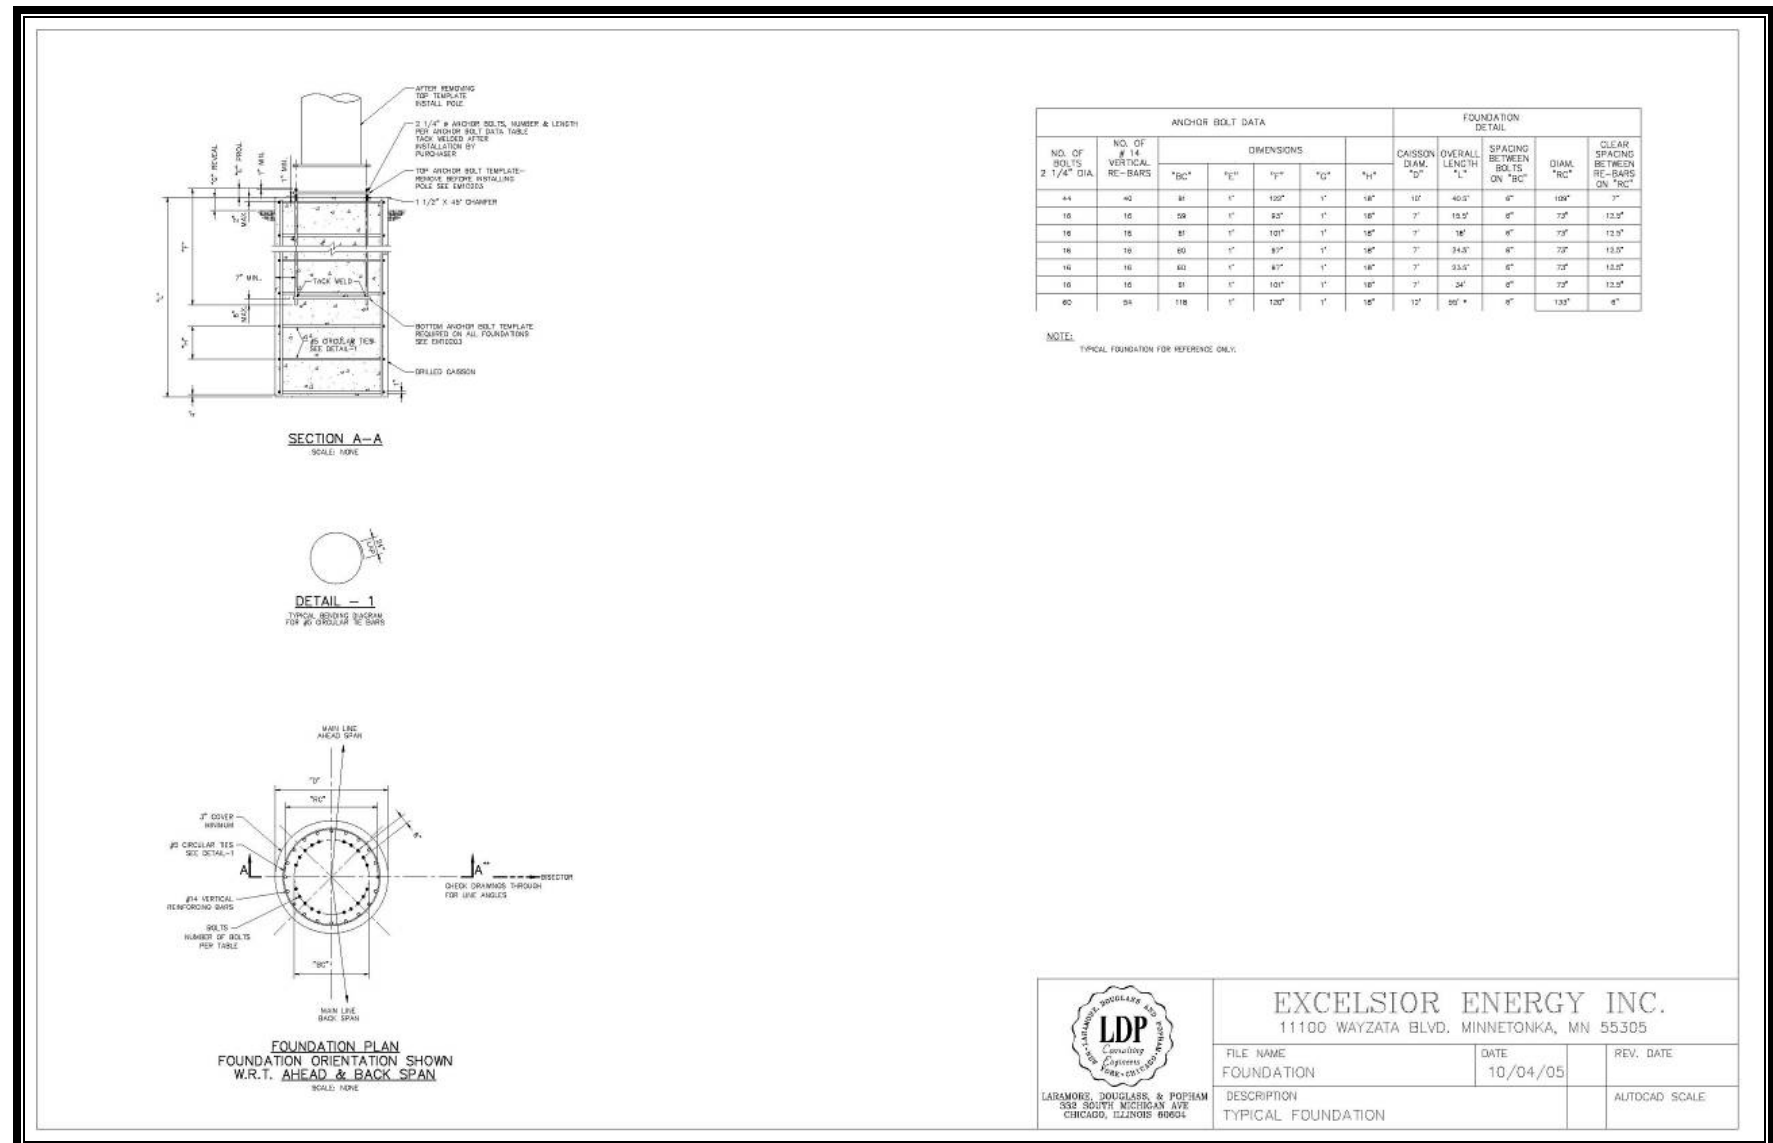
Pile Foundations for Poorly Drained, Compressible Soils
